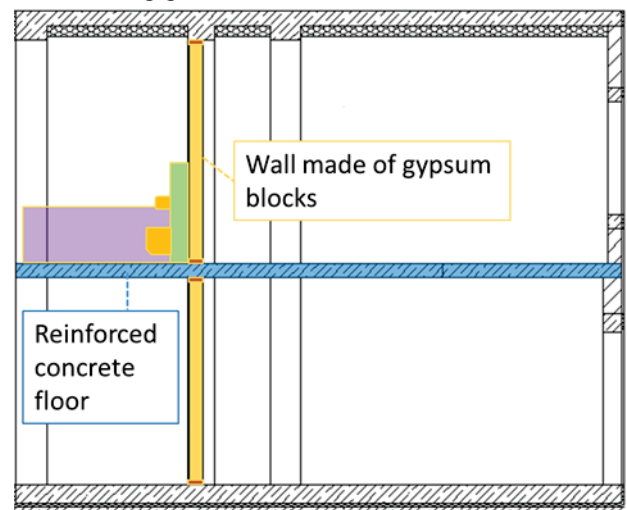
Vertical section of building-like test rig with sanitary installation system (green) connected to the installation wall made of 10 cm thick gypsum blocks with density 1200 kg/m^3 , decoupled on all sides, and to the floor made of 18 cm thick reinforced concrete.
